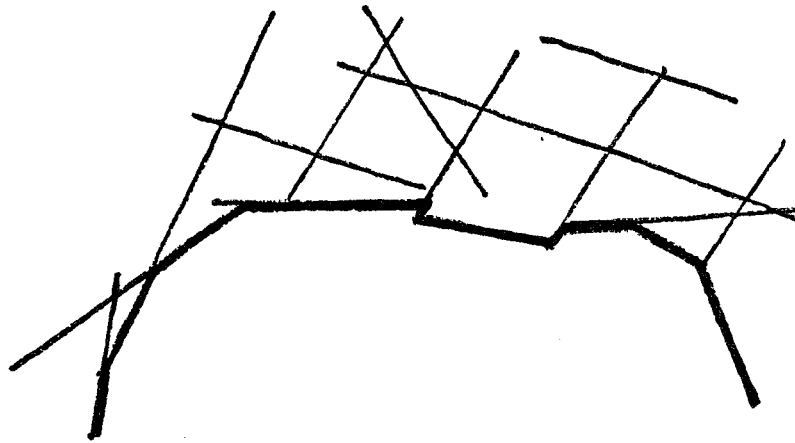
Schematic picture of the roof shape of a blasted tunnel.
